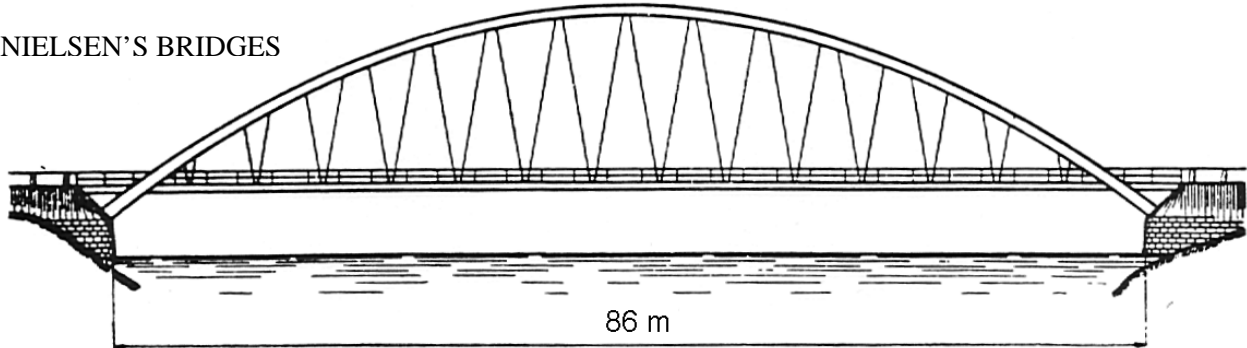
Bridge over Øster-Dalelven in Sweden. Design of this bridge started in 1921.
